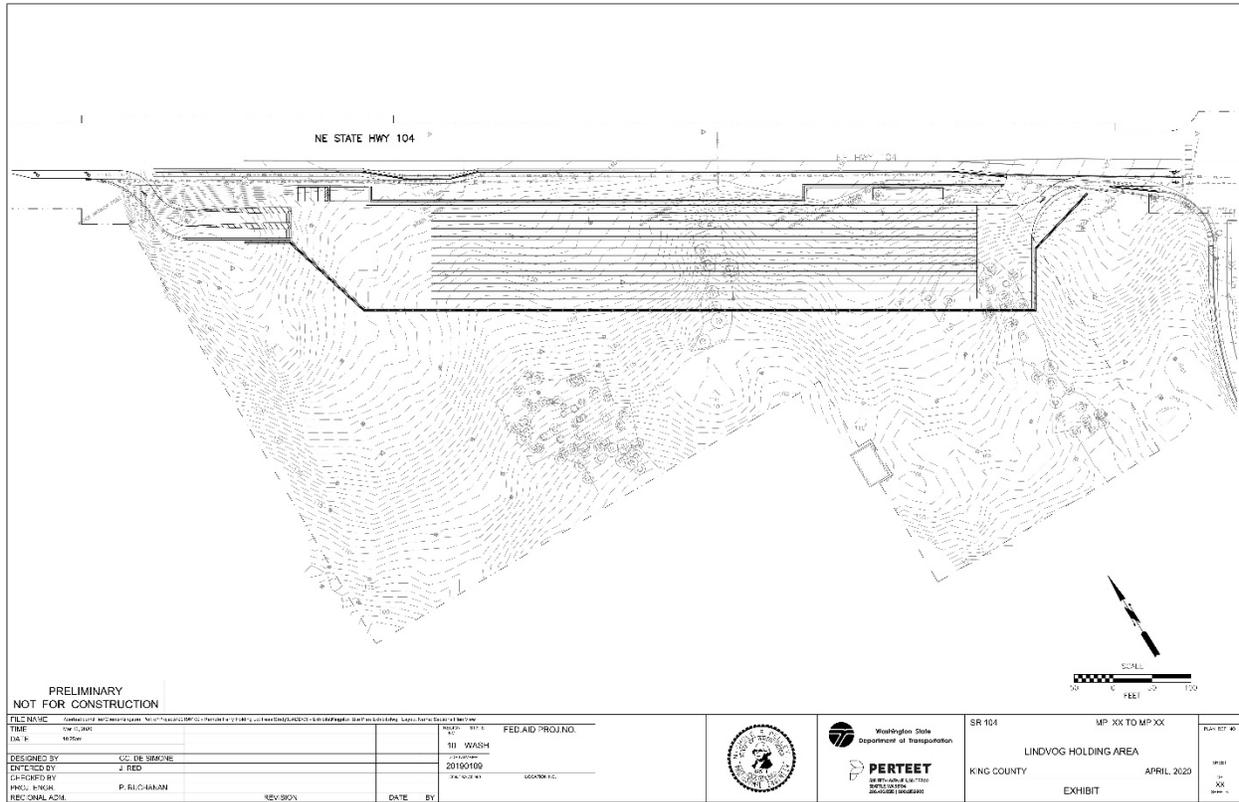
Proposed Remote Holding Lot Concept Layout.
